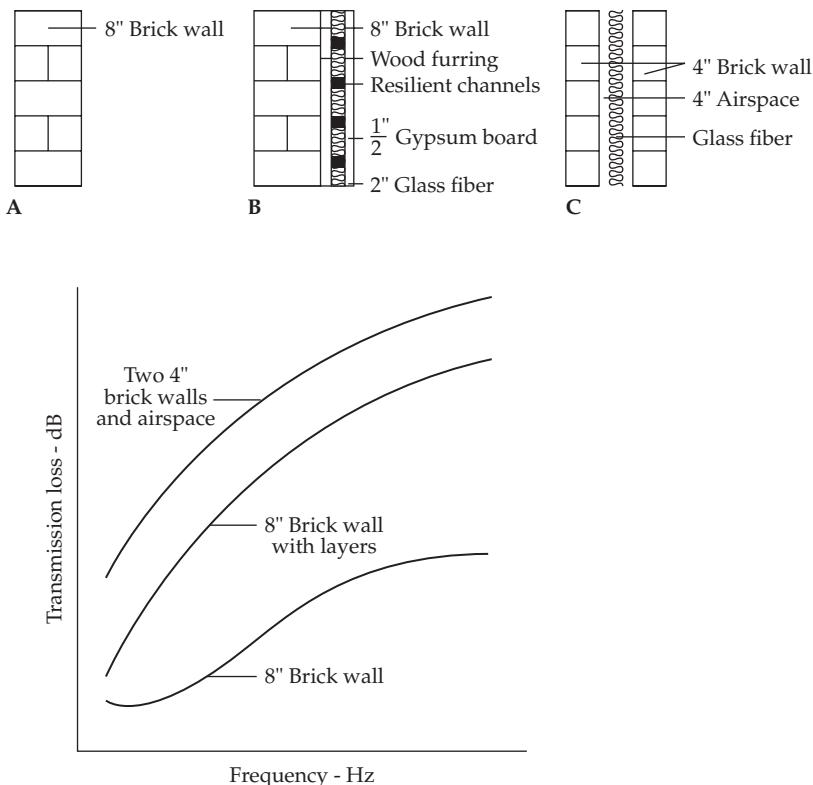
The transmission loss of masonry walls can be improved by adding a layer or by constructing two walls. (A) An 8-in brick wall provides good sound isolation. (B) Added layers improve transmission loss at higher frequencies. (C) Two 4-in brick walls separated by a 4-in airspace provide superior isolation.
